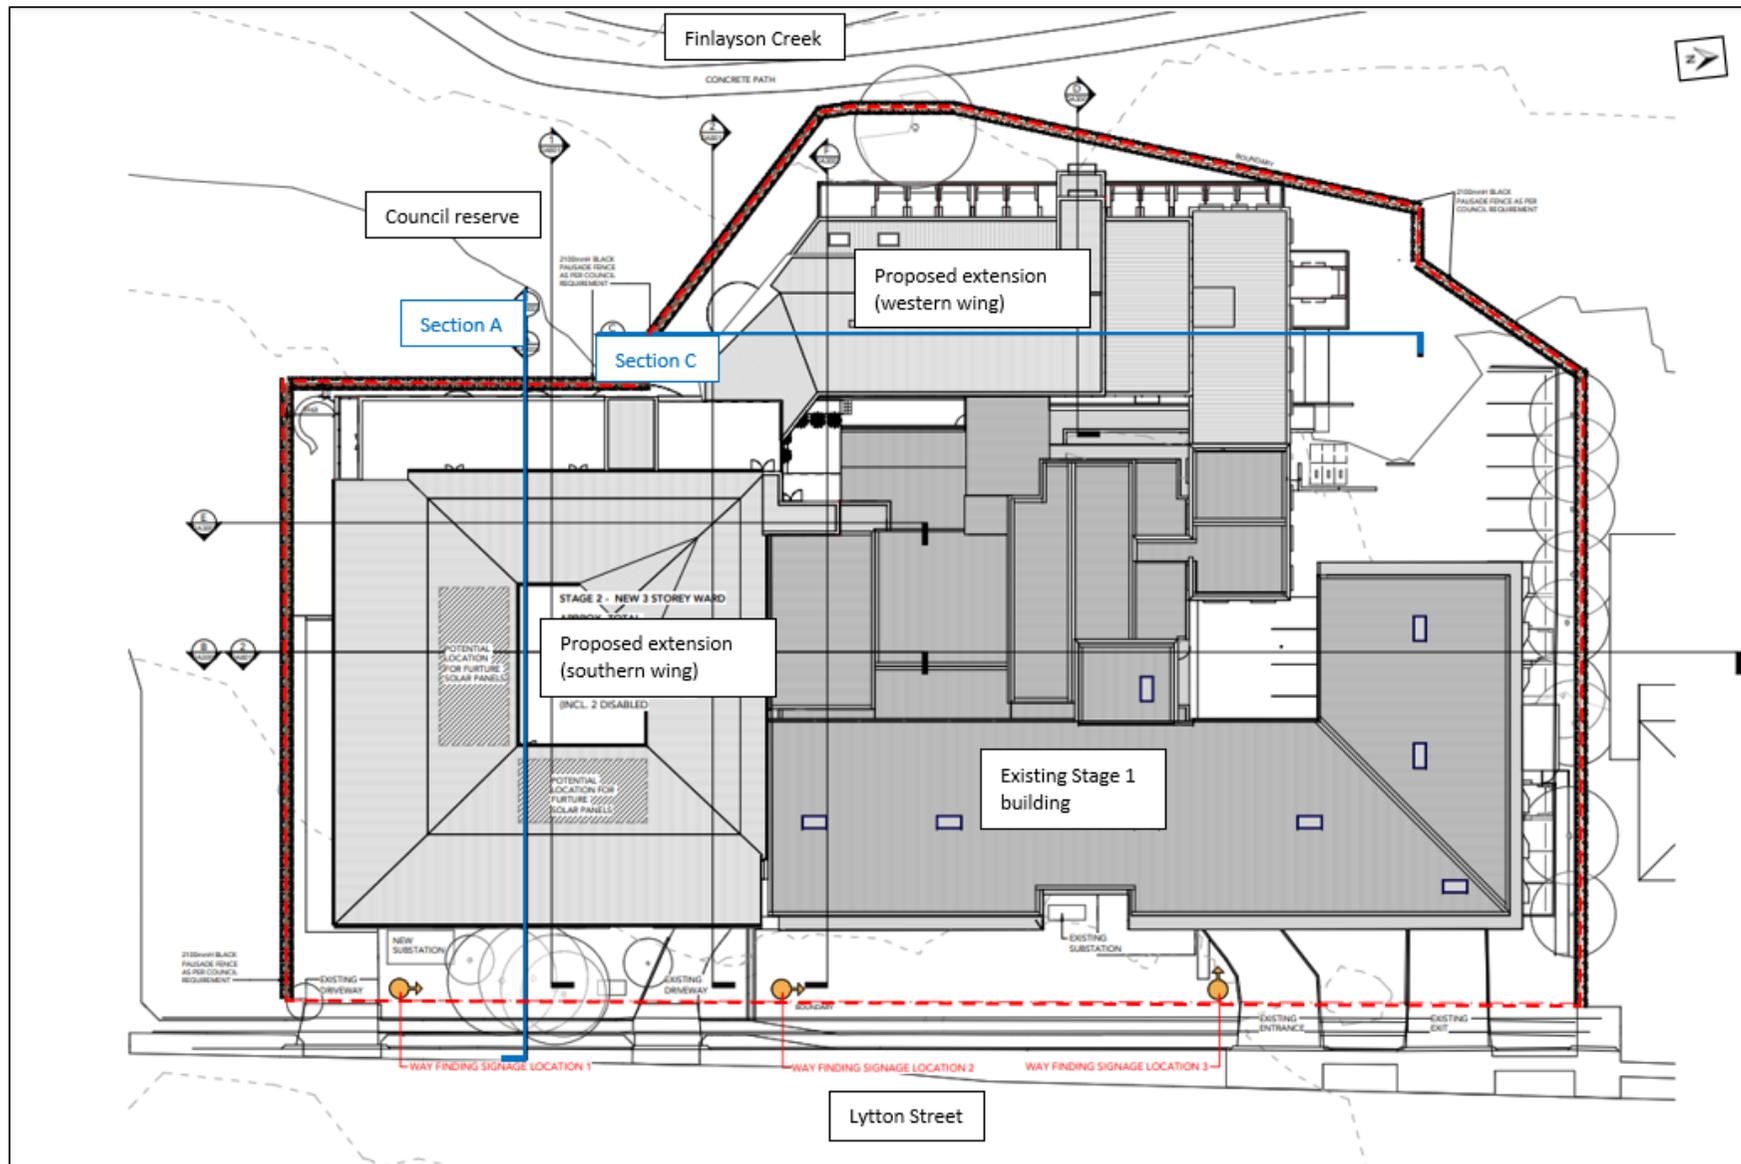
| Proposed WNBC site layout (Source: Applicant's SRtS)
